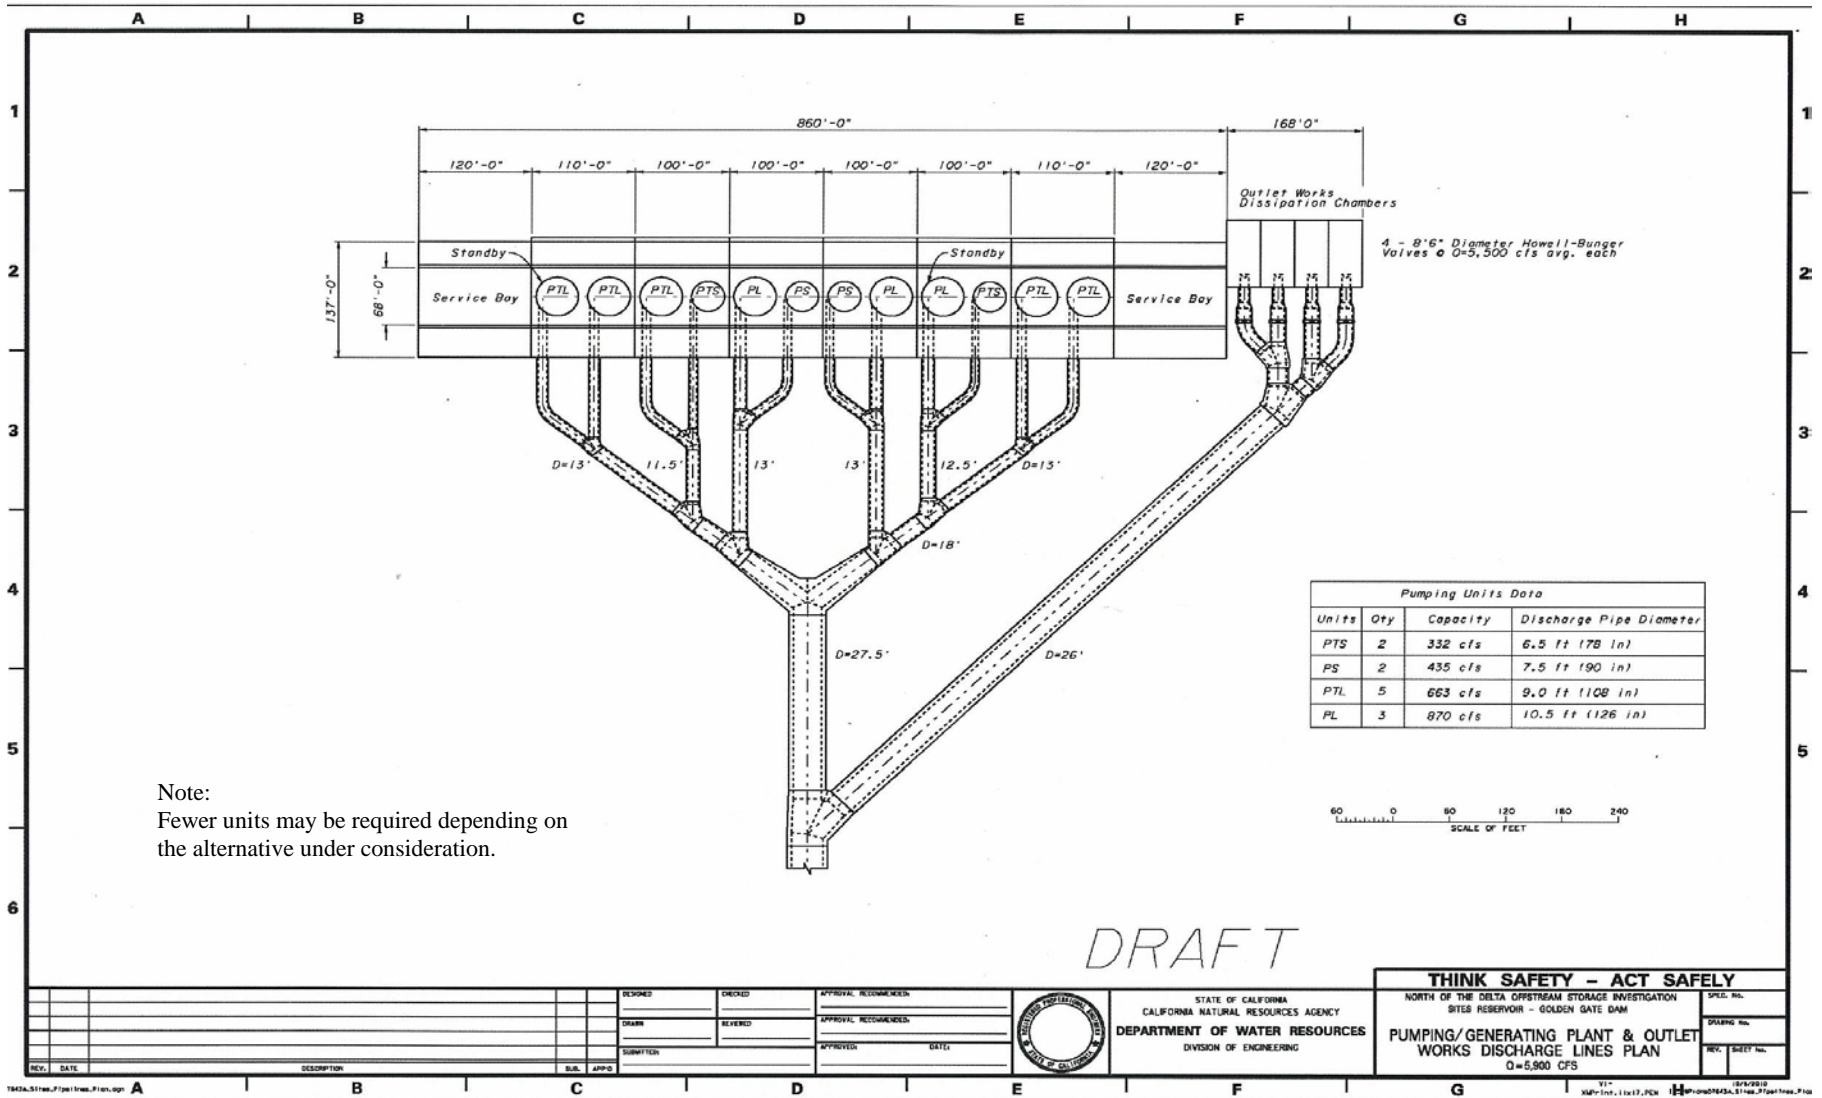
Sites Pumping/Generating Plant – Discharge Lines Plan – Q=5,900 cfs
